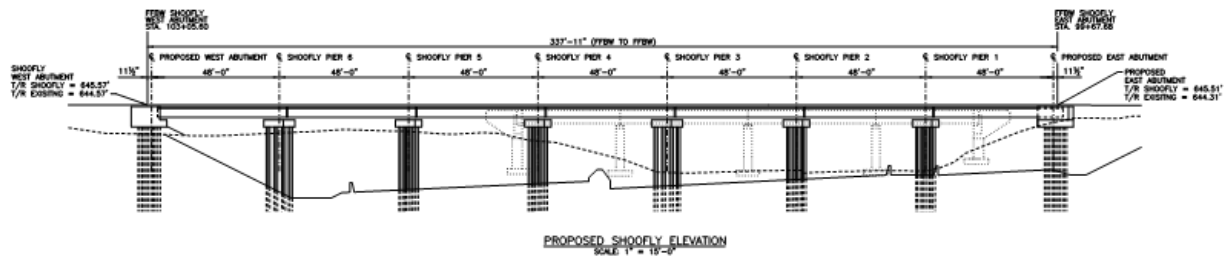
Proposed 7 Span Temporary Shoofly Bridge
